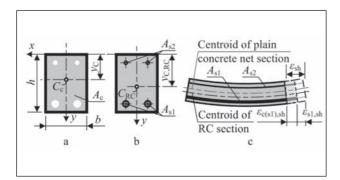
Deformations of asymmetrically RC member due to shrinkage: a) plain concrete net section; b) asymmetrically reinforced section; c) deformations in asymmetrically reinforced element due to restrained shrinkage
